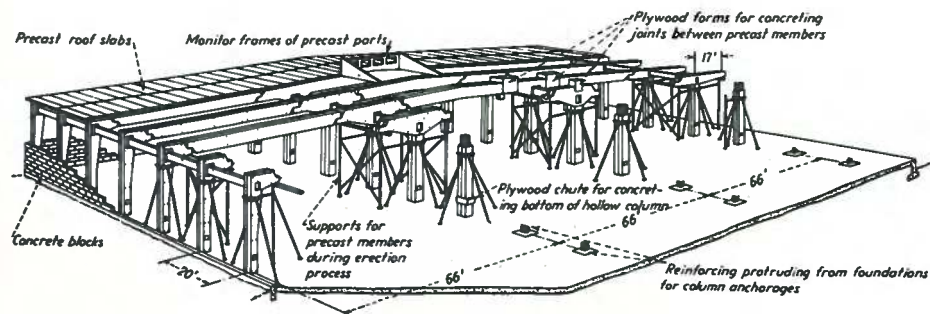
Details for the construction of three bay U.S. Navy precast concrete warehouses in the late forties and early fifties.
